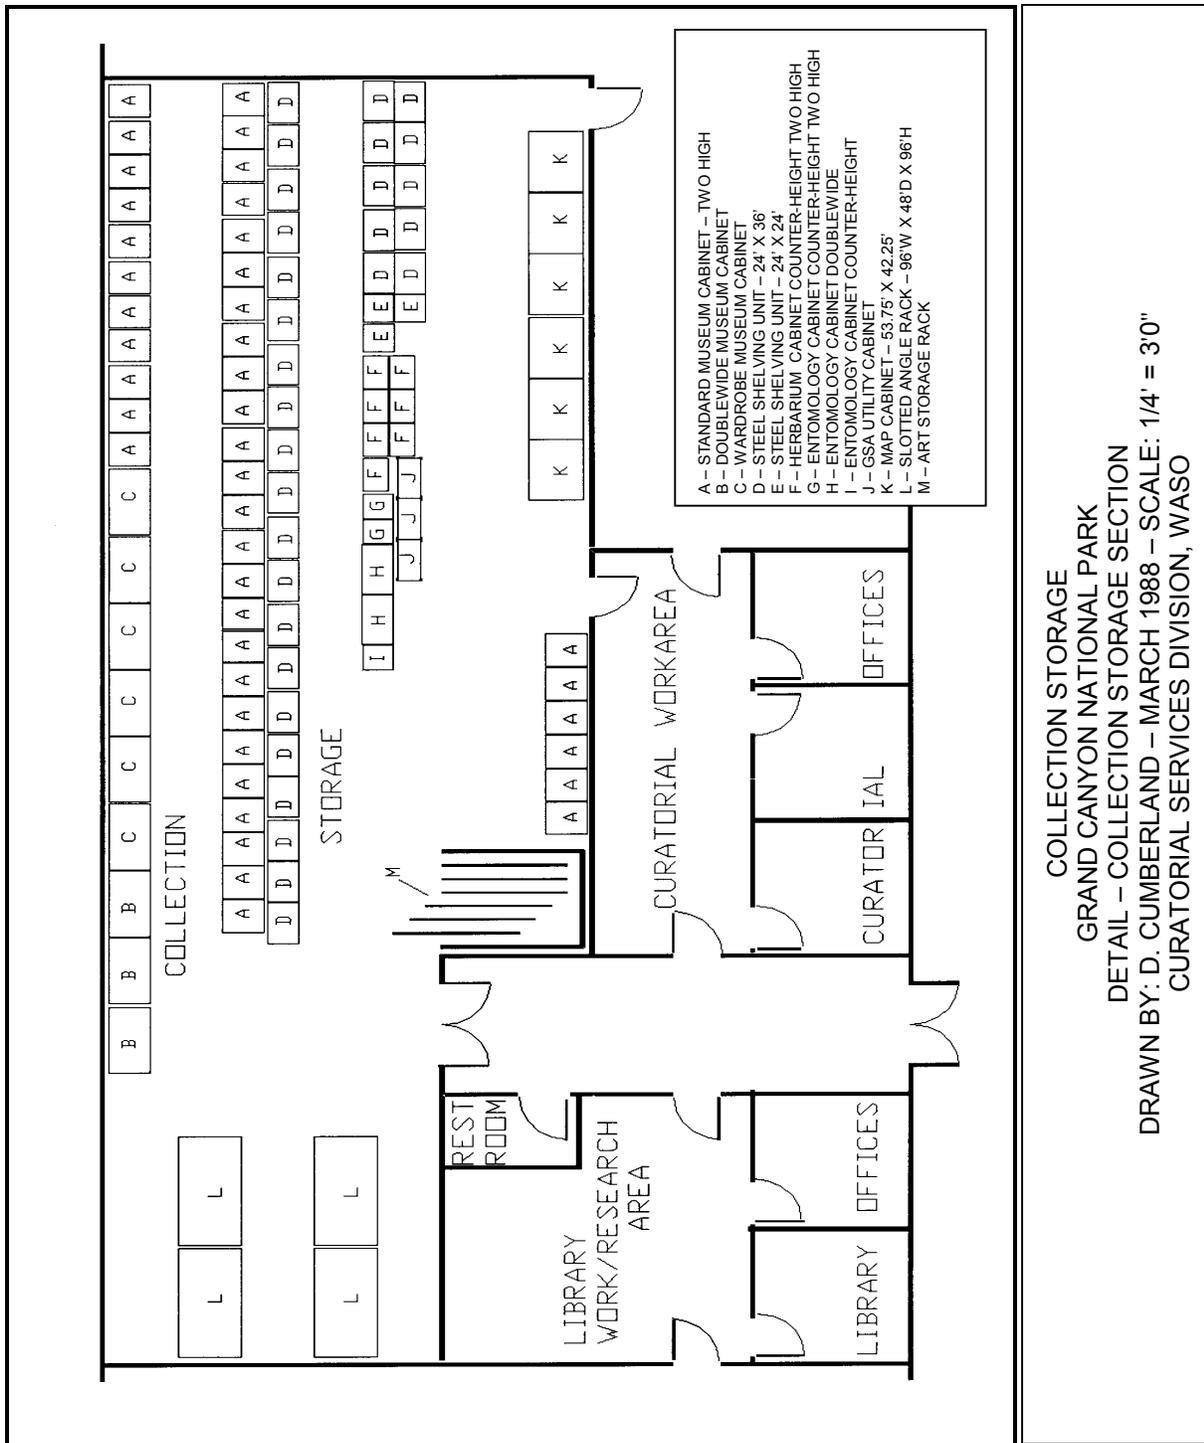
Floor Plan of Proposed Museum Collection Space at Grand Canyon National Park. *Drawn with AutoCAD® Computer Assisted Design Program.
